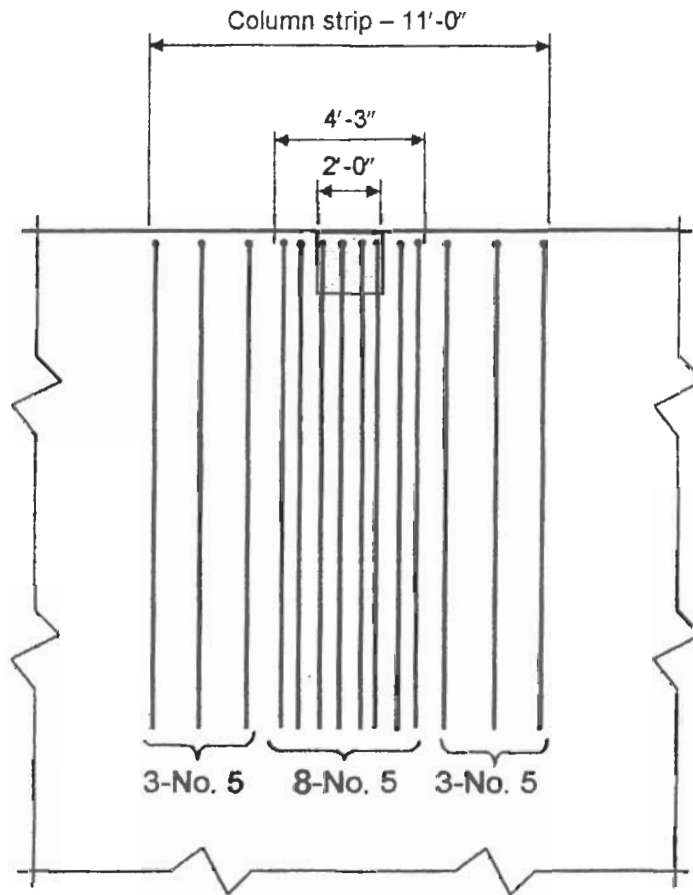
Reinforcement Detail at Exterior Column (SDC C)
